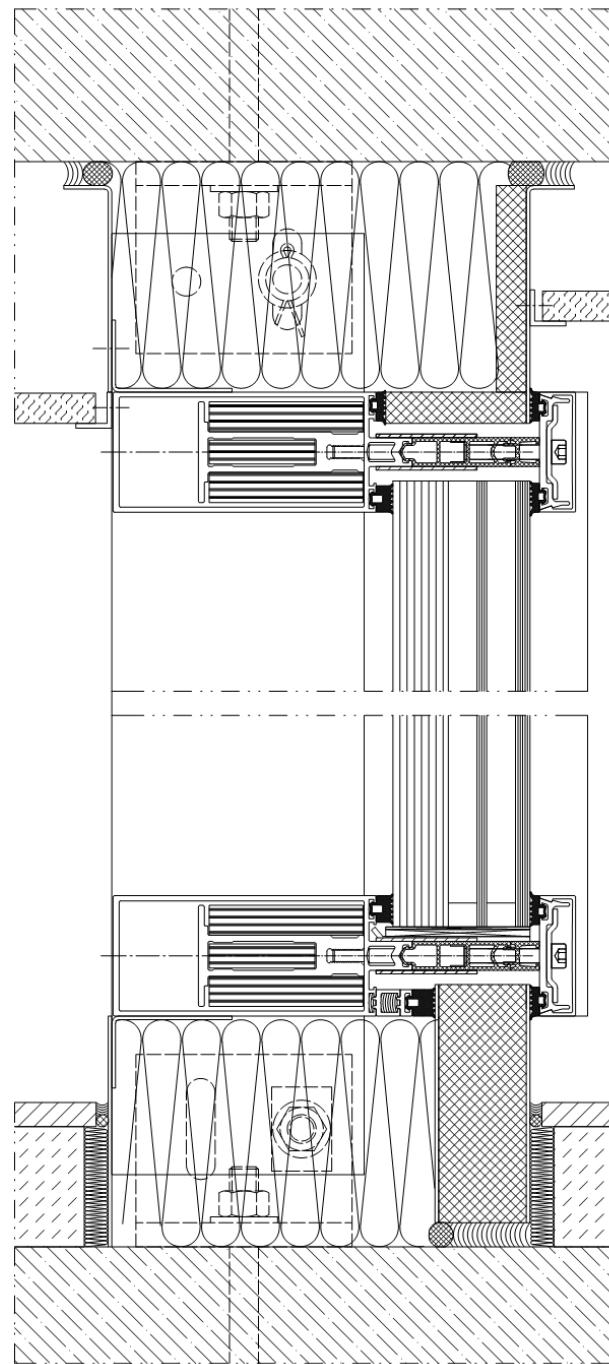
MB-SR50N EI EI60 system between floors curtain wall - vertical cross section
